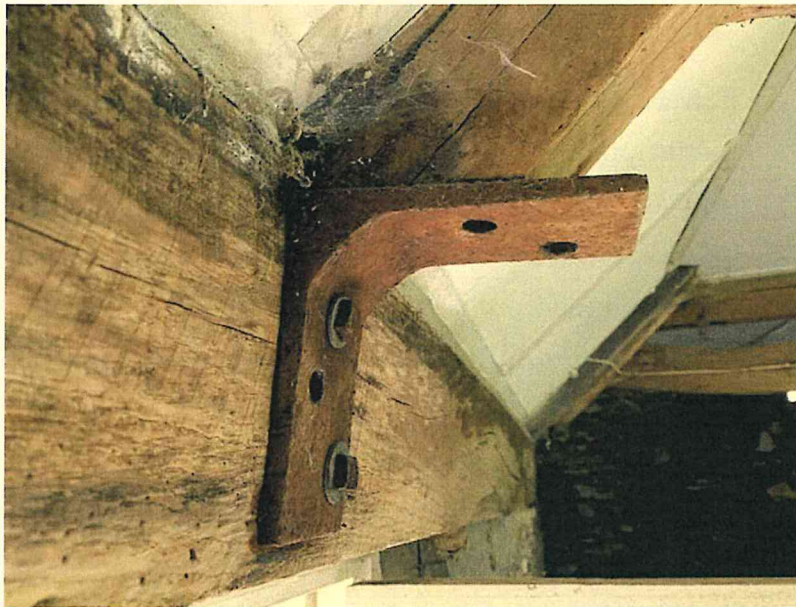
Internal view on ceiling boarded roof structure to west end of barn.
